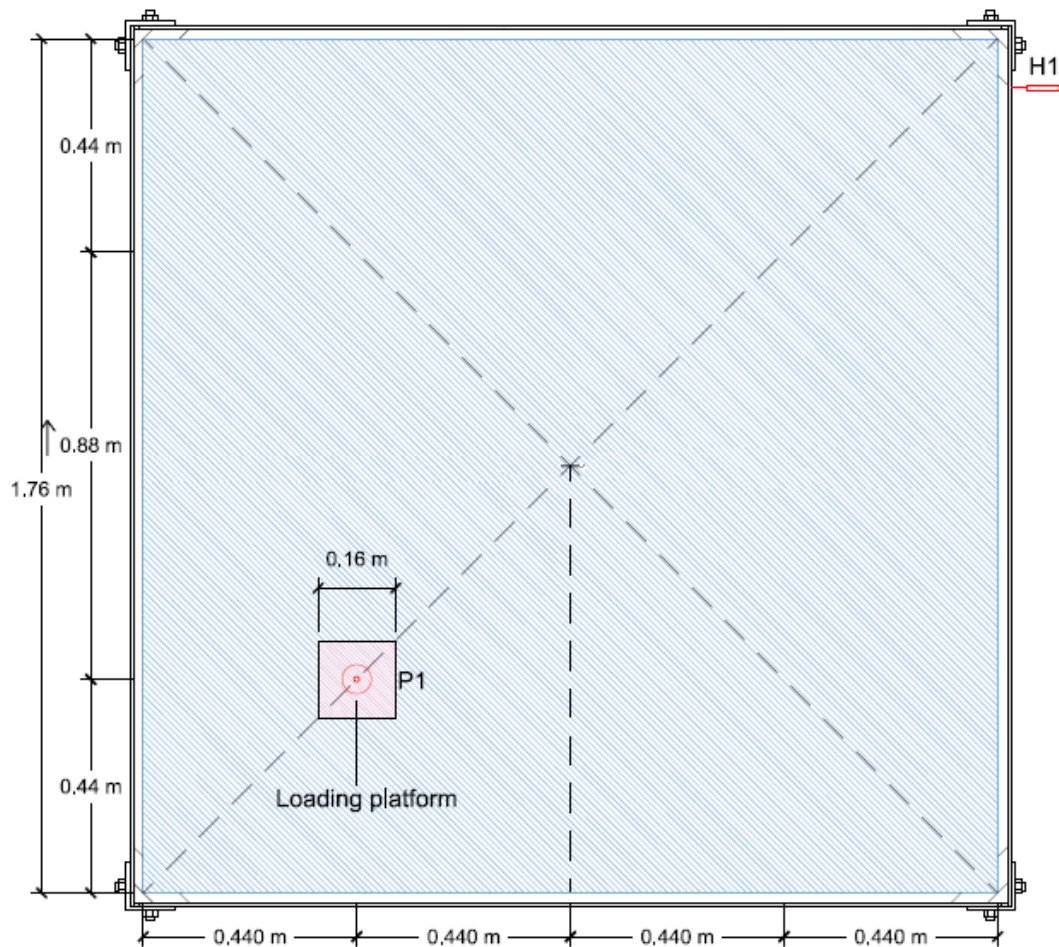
Composite sail dome prototype plan view geometry (David Lopez)
